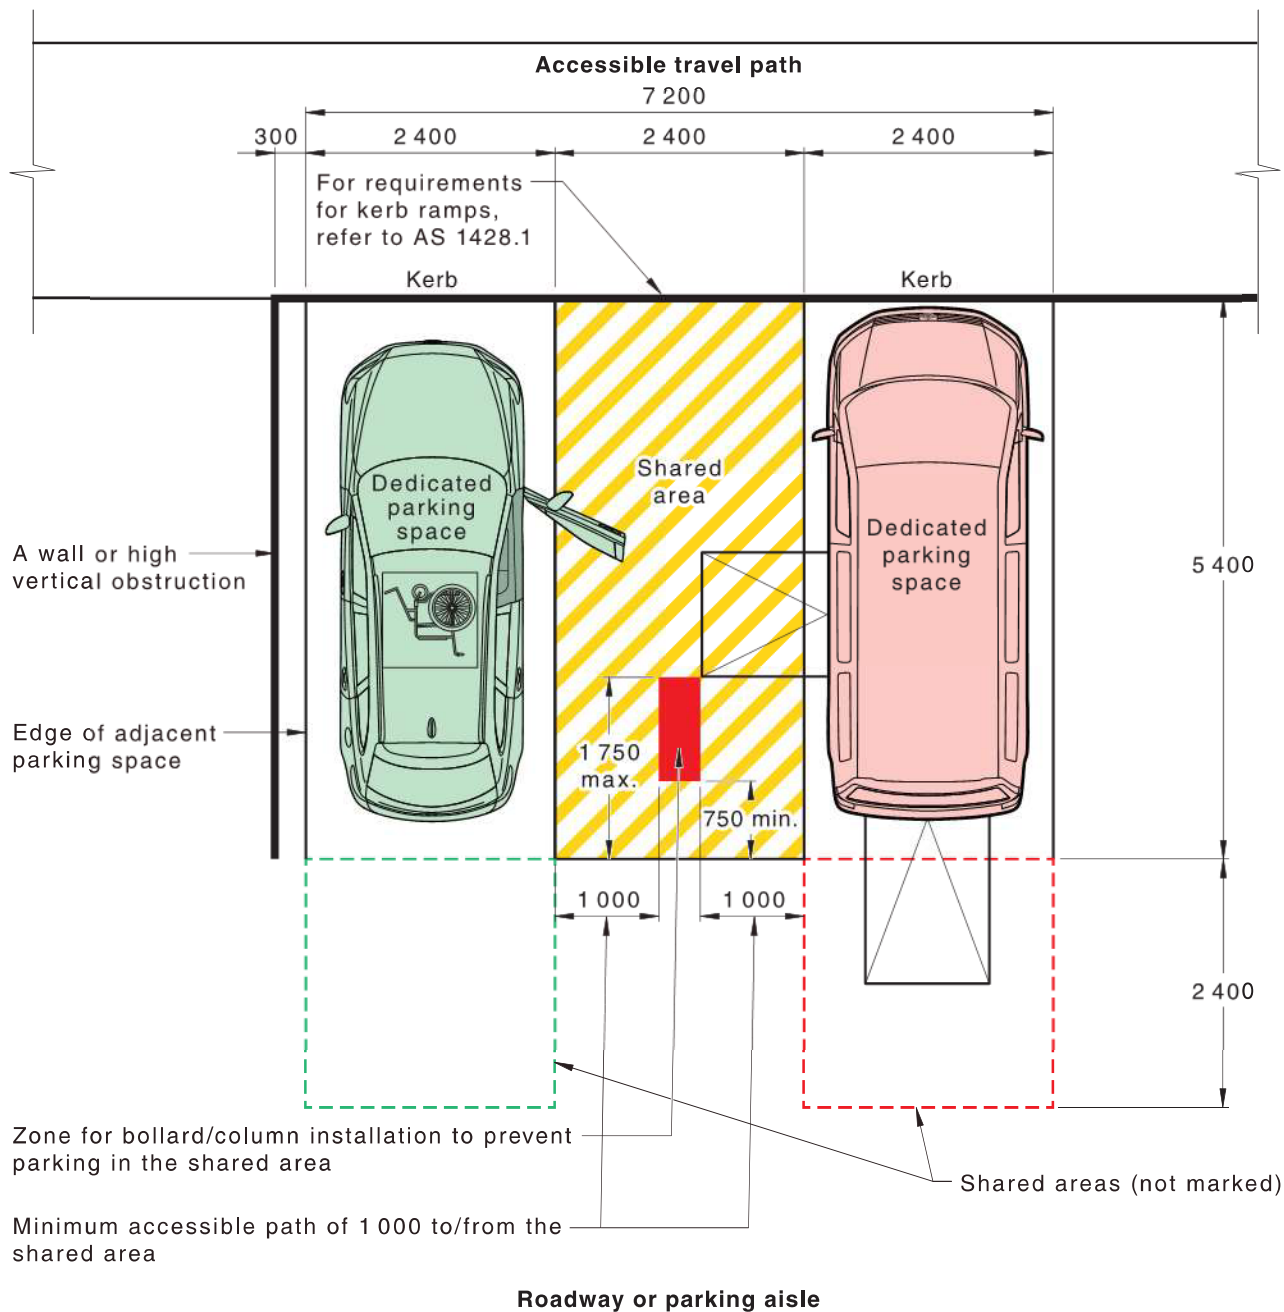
Example of two parking spaces with a common shared area and accessible path of travel at grade with parking spaces
